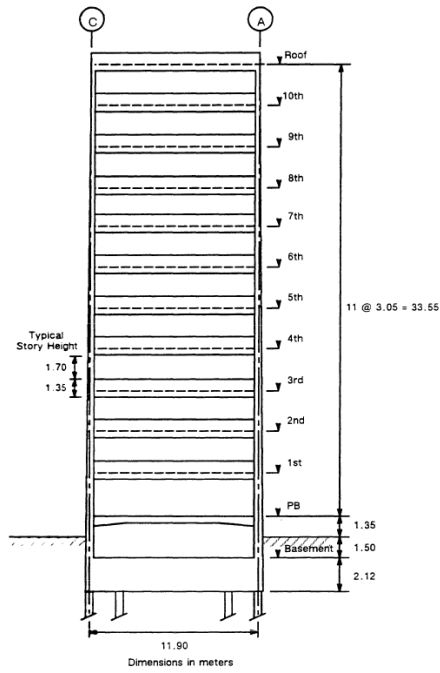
Elevation of Frame 5 of the building prior to retrofit (Downs, et al., 1991)
